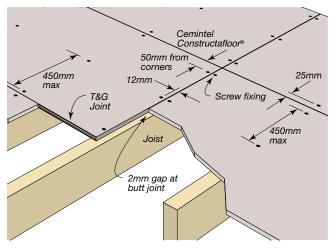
Constructafloor Fixing Detail – Screw Fixing
